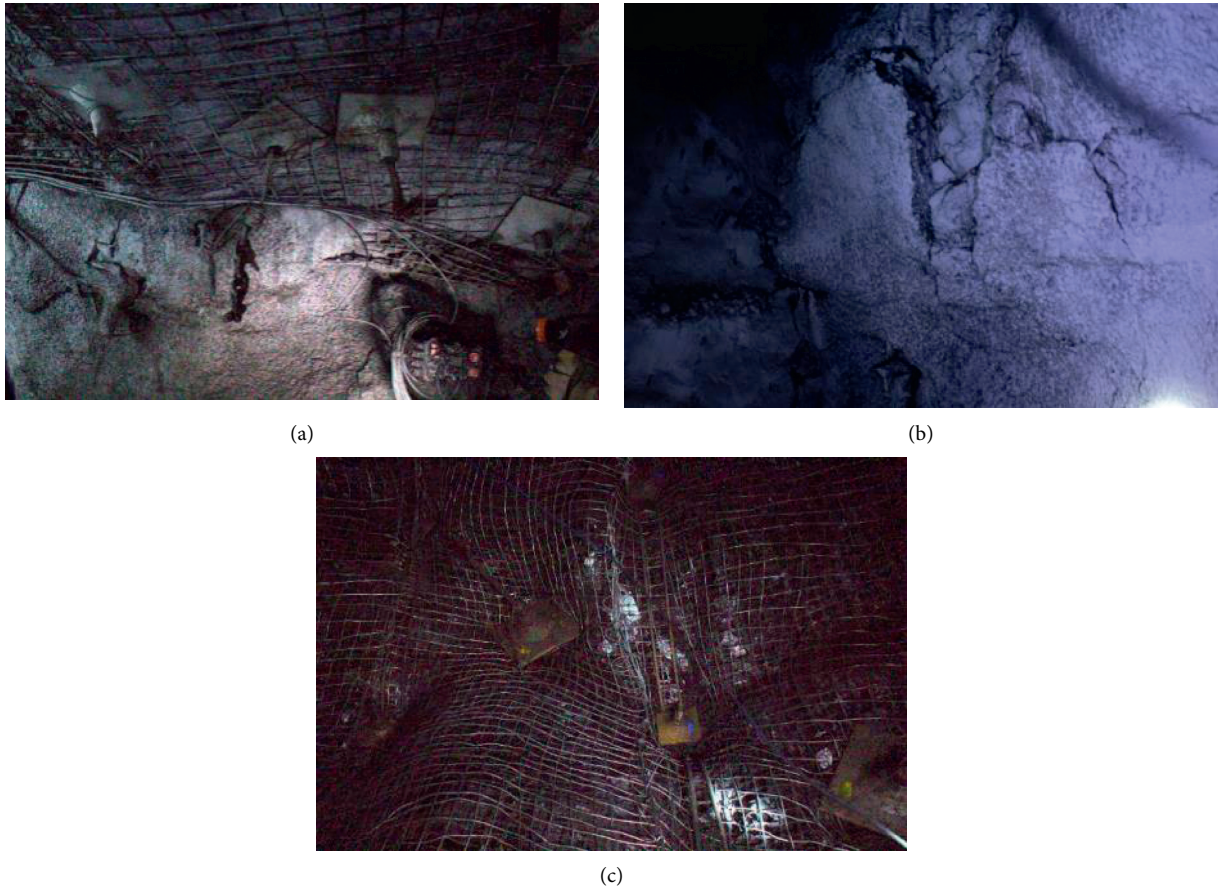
Roadway damage forms. (a) Roof collapse. (b) Spalling rib. (c) Anchor failure.
